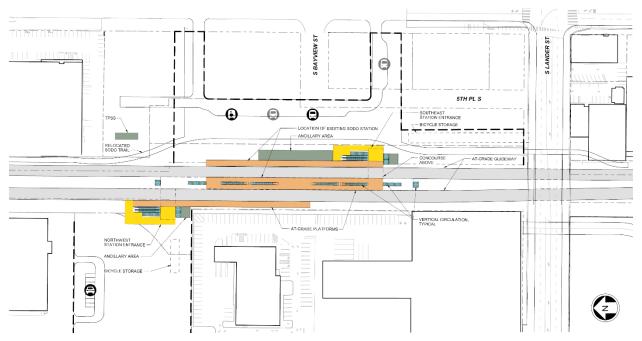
Draft EIS SODO-1a Staggered Station Configuration Plan (Platform Plan)
